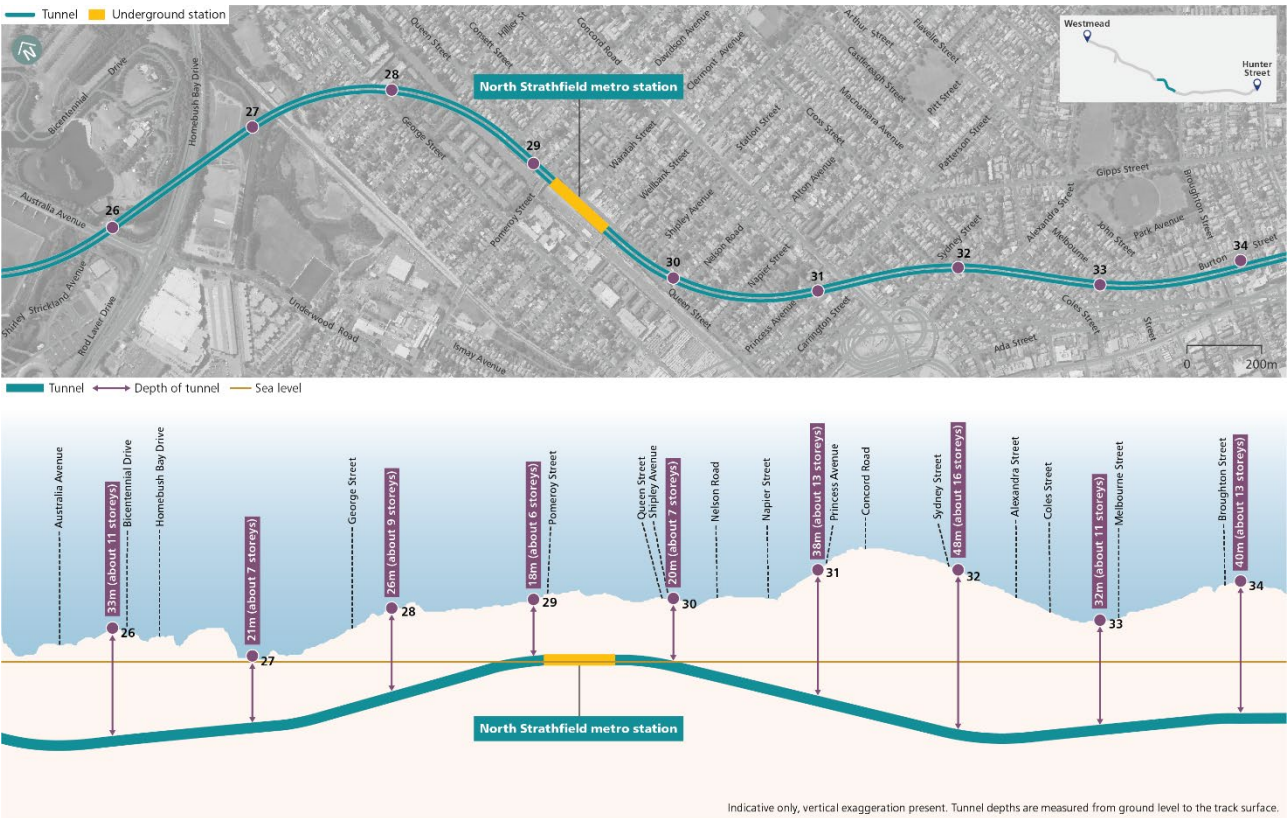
Indicative alignment plan and long section (4 of 8)
